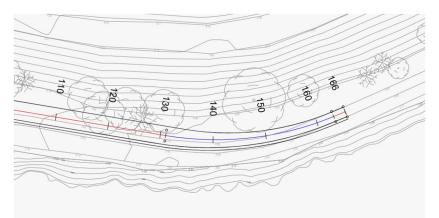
Excerpt from the 'Roads & Footways' drawing of the Ro-Ro Terminal Yard (Source: Dwg. No. CP1901-3FM-RPS_S26-HML-AT-DR-HE-100-0002)
